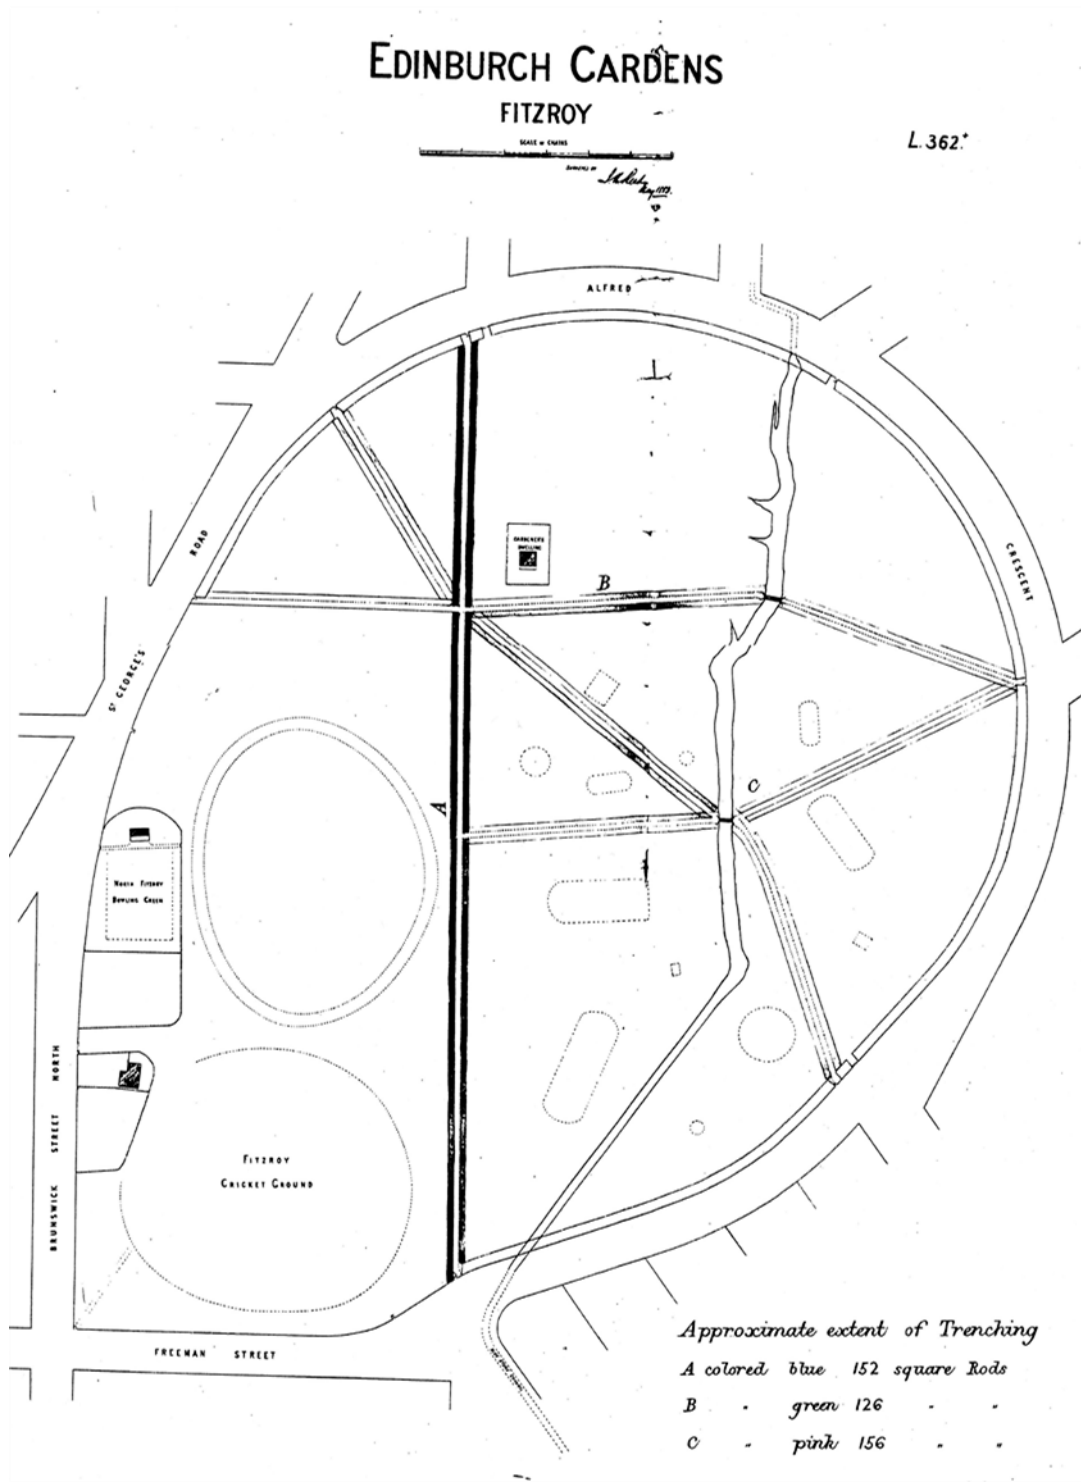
1883 trenching plan for the Edinburgh Gardens avenues
